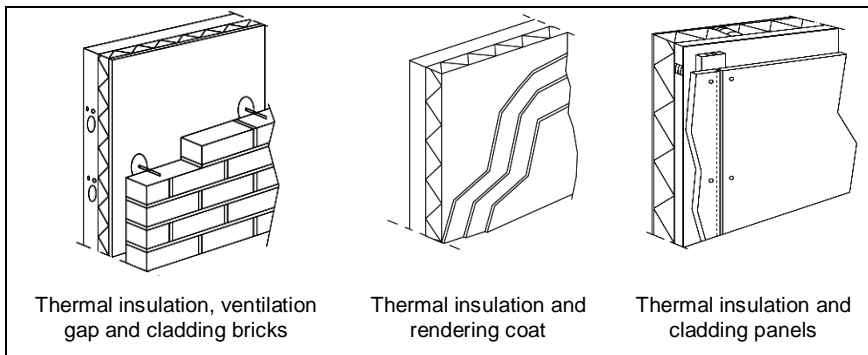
Additional thermal insulation and cladding methods for concrete facades (Haukijärvi 2005).
